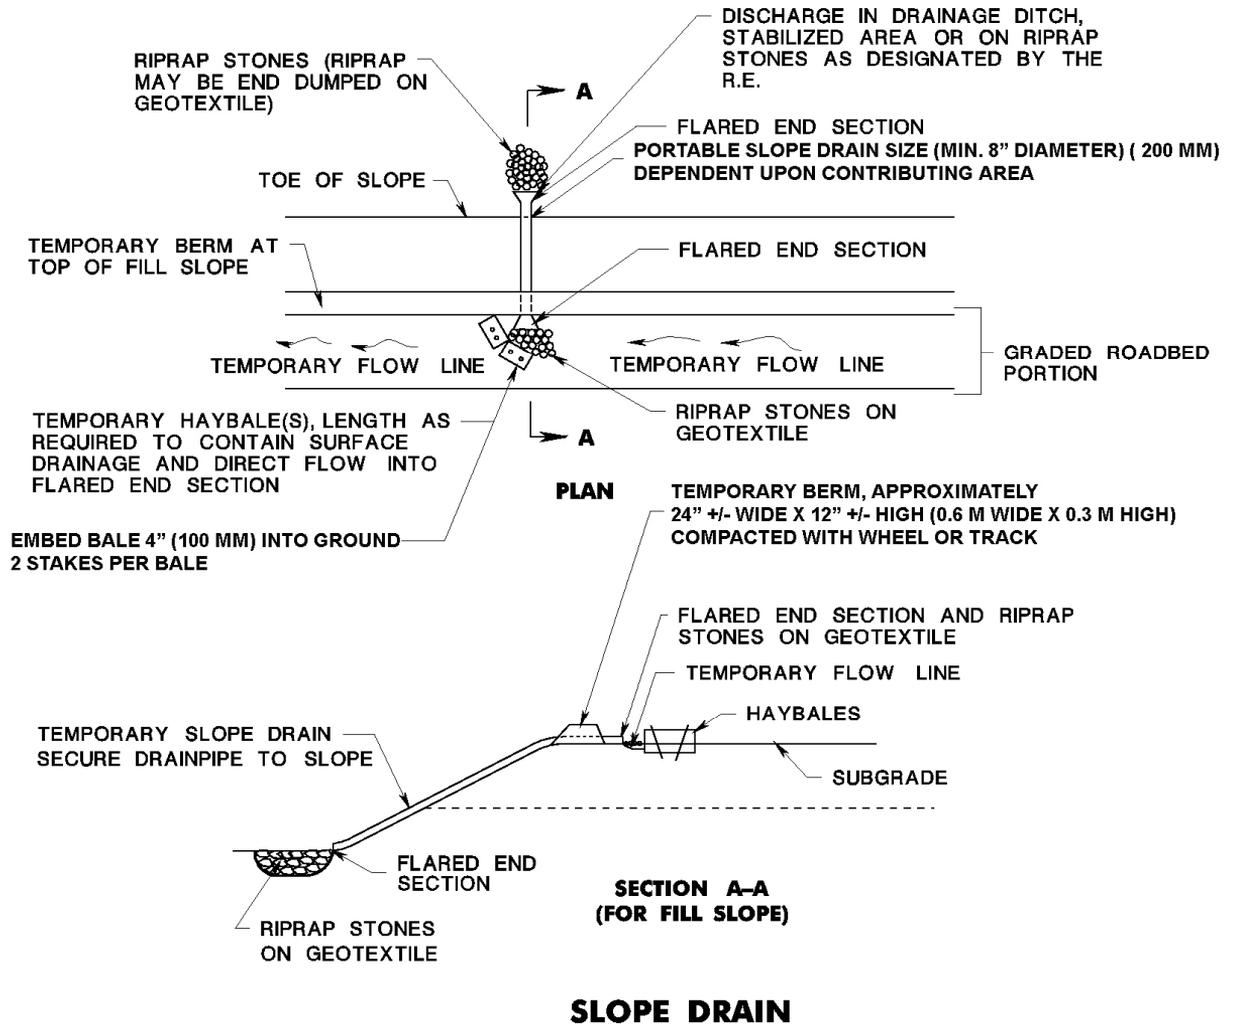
FLEXIBLE DOWNDRAINPLAN VIEW
